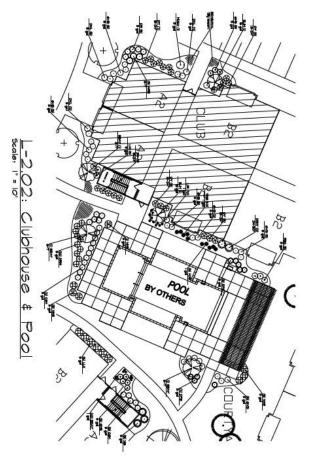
EXHIBIT E: LANDSCAPING PLAN (CONT.)
